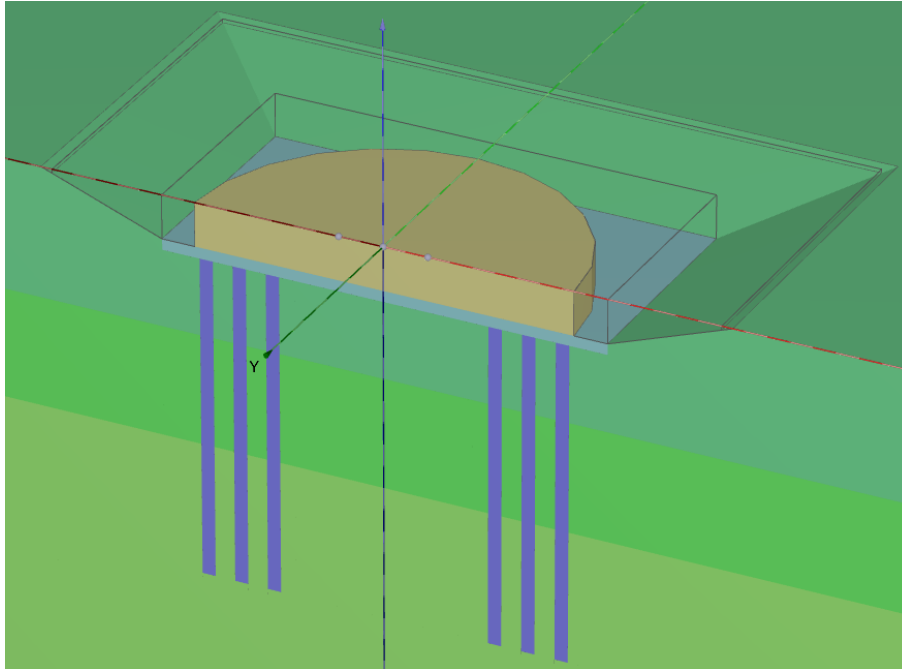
Model geometry with column heads beneath the stabilized soil layer at -2.5 m (v01.44.1)
